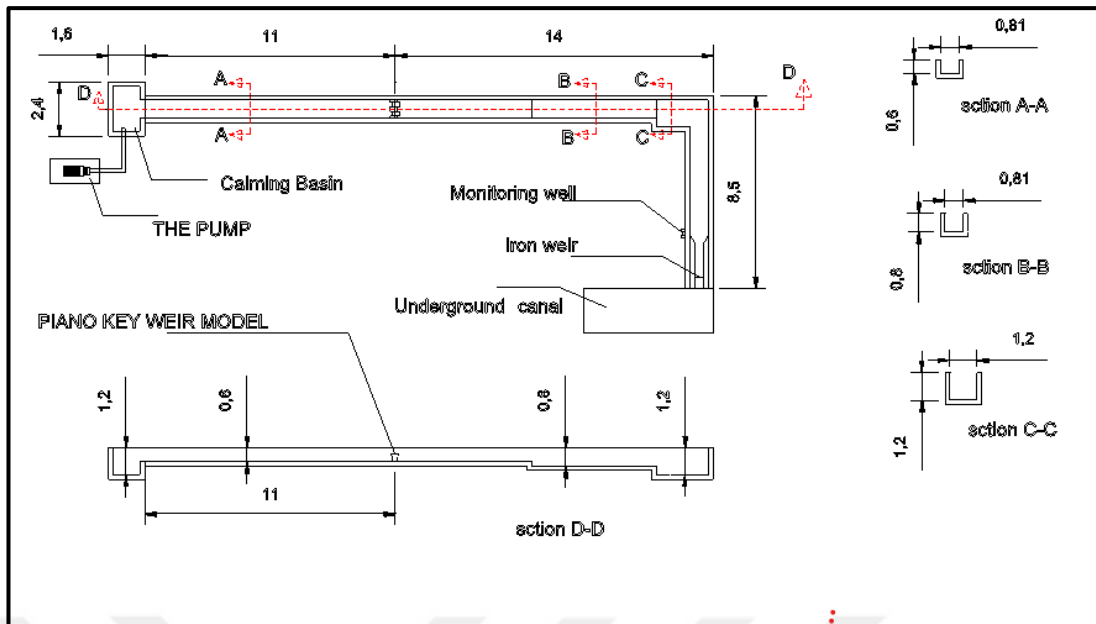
Plan, Cross-sections, and longitudinal section of the laboratory channel
